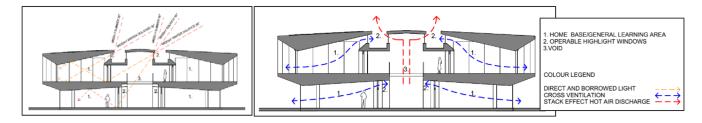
| Typical home base module cross section (Source: Applicant's EIS 2019)
